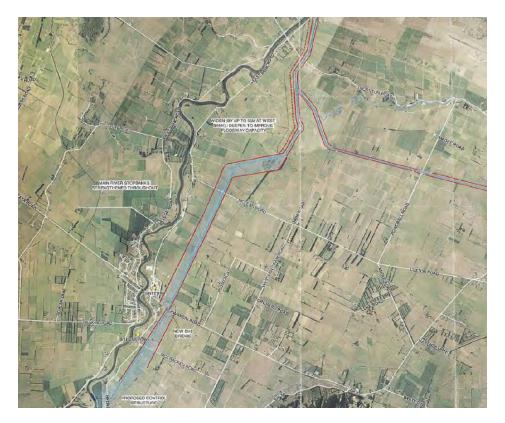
PLAN OF RANGITAIKI FLOODWAY (SOURCE: RESOURCE CONSENT PLAN 65616/2)
